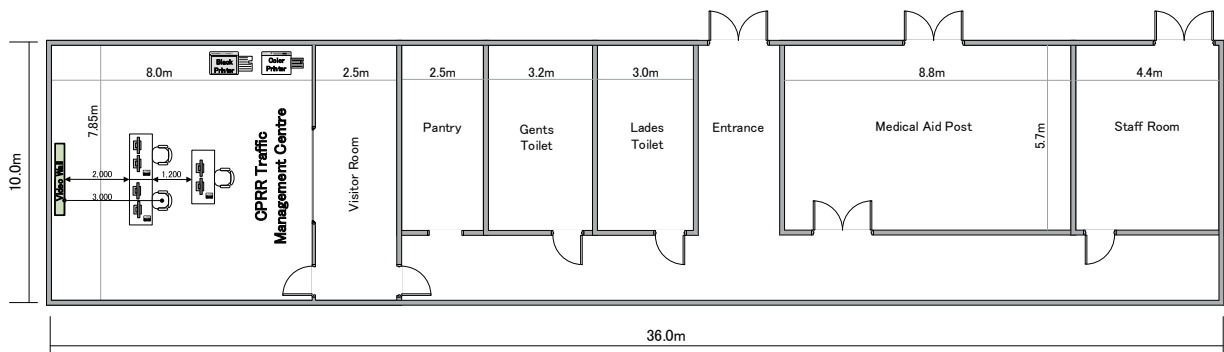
shows the location plan for the Traffic Management Center.
